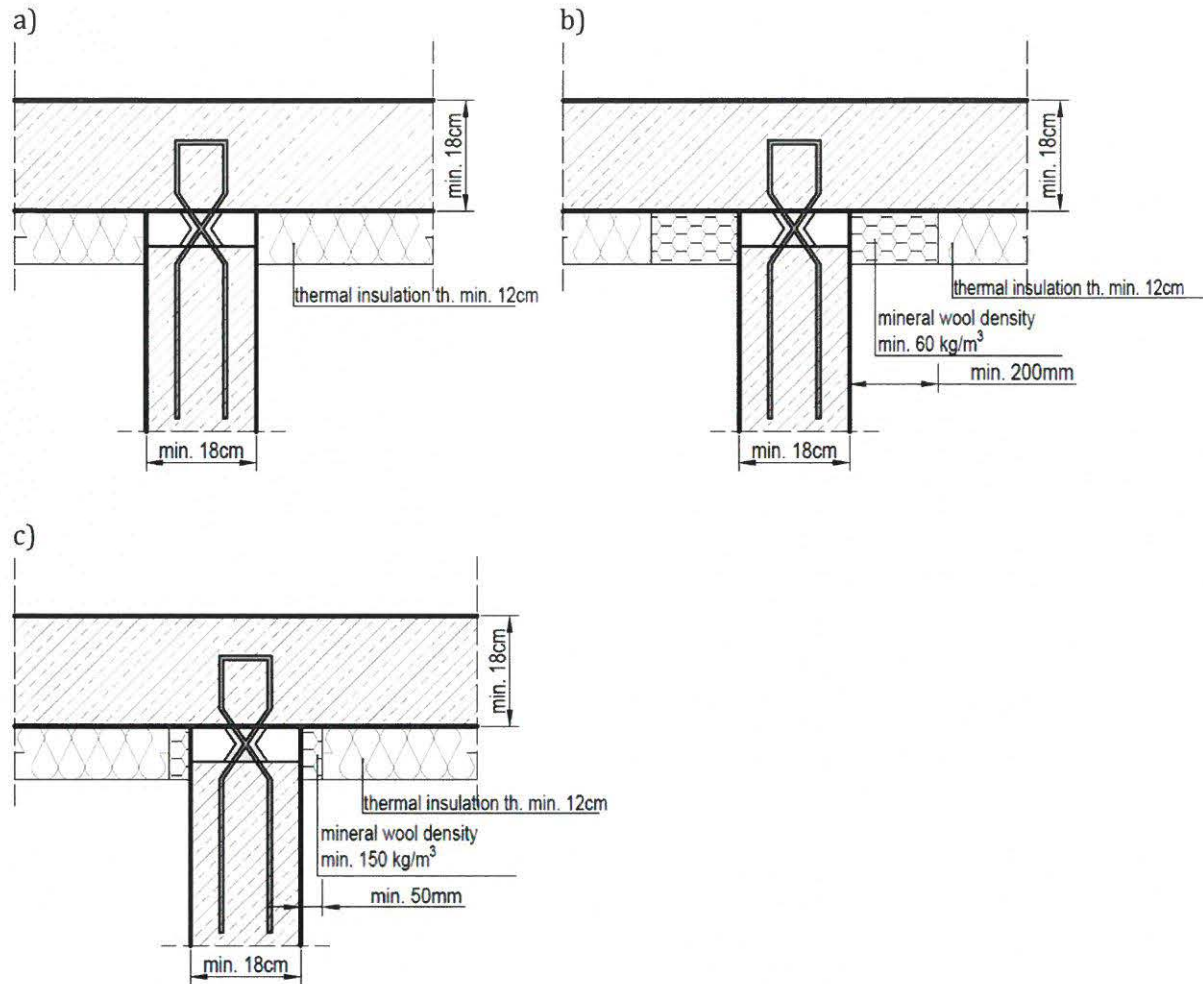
Internal wall and floor/flat roof connection with Schöck Alphadock / Sconnex Typ W
